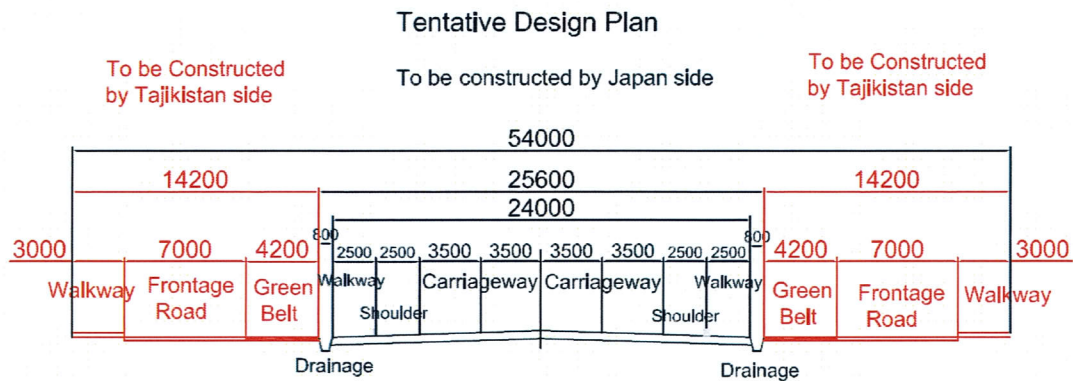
Master Plan of Bokhtar city and overlap section with Japan project
